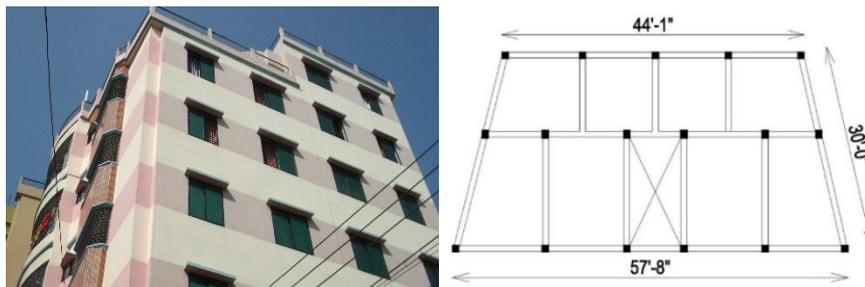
(a) Prospective view of the index building; (b) typical floor plan.
